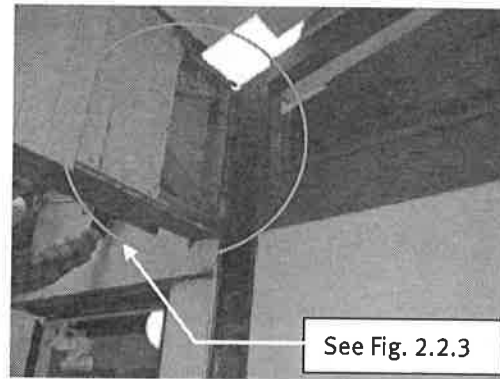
Below Deterioration at Northwest Corner of Sloped Roof
